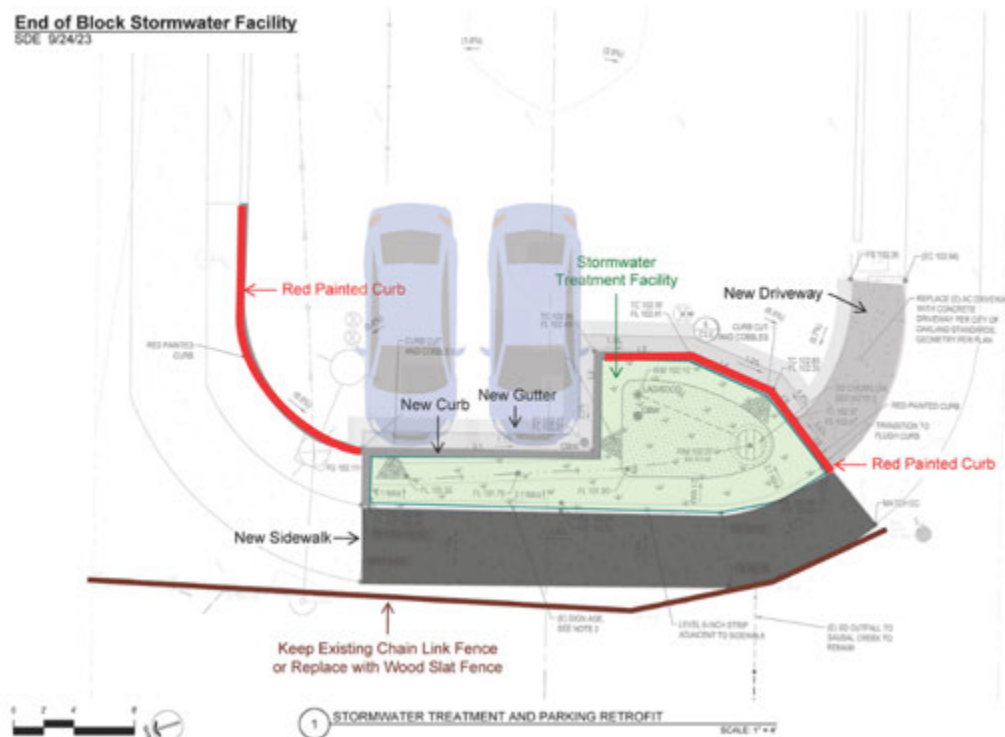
Final design for the stormwater bioretention facility. Credit: Sherwood Design Engineers
